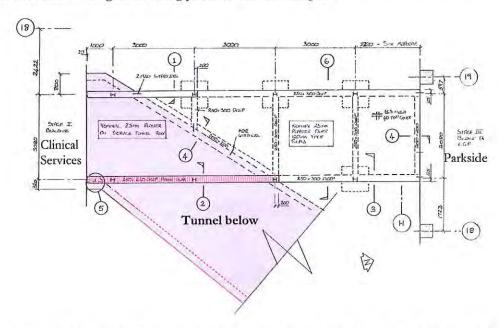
Lower Ground Floor Plan of Link B indicating location of tunnel below
